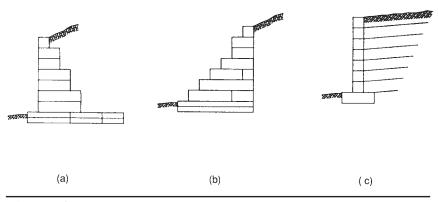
Typical cross sections for a) gravity gabion wall (stepped); b) semi-gravity gabion wall; and c) reinforced soil gabion wall.
